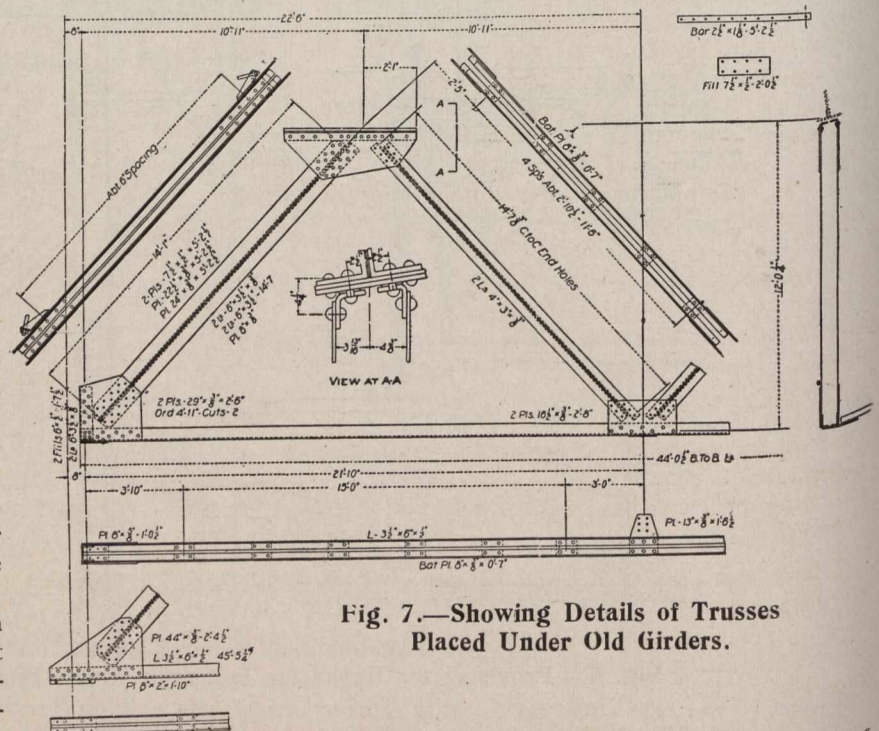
Showing Details of Trusses Placed Under Old Girders.
